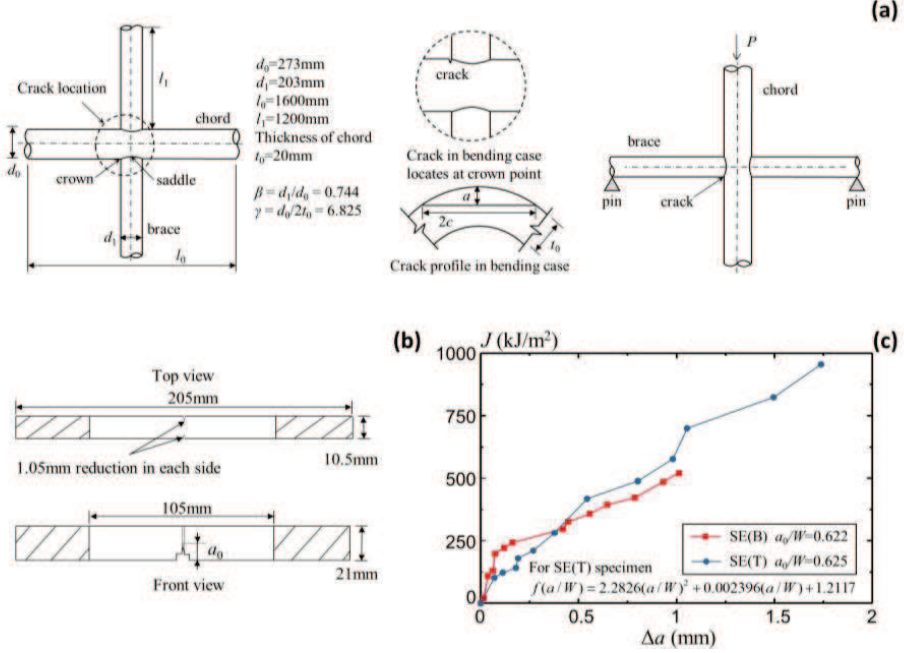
(a) Information on the CHS X-joint under in-plane bending; (b) Configuration of fracture specimen; and (c) J - R curves of fracture specimens.
